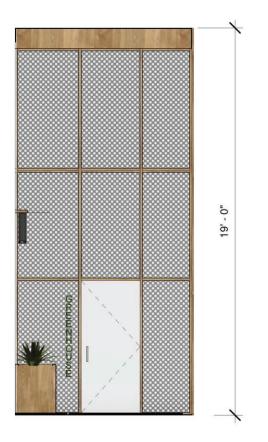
Greenhouse corridor and north wall elevation. NTS.
